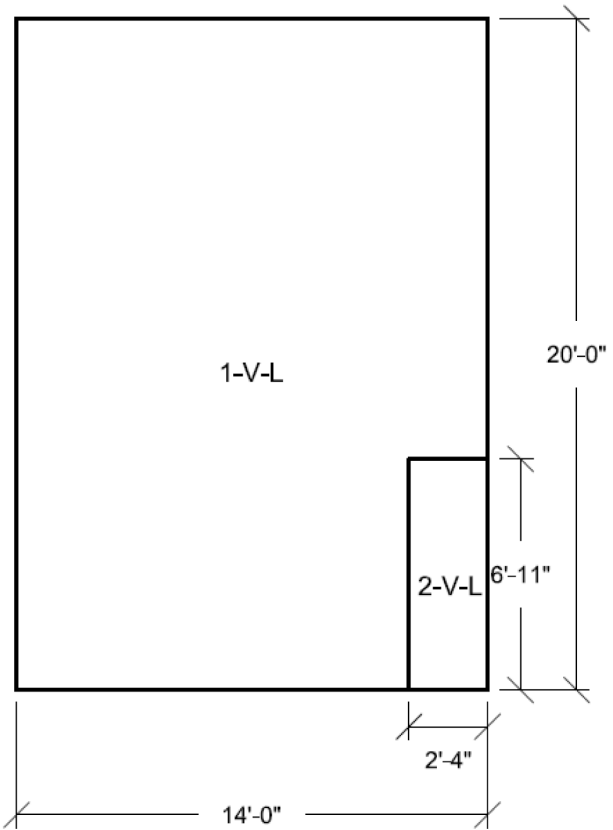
H.6-178 DGFOVS Wall 10 Looking From Outside Vertical Reinforcement Zones Near Side Face
